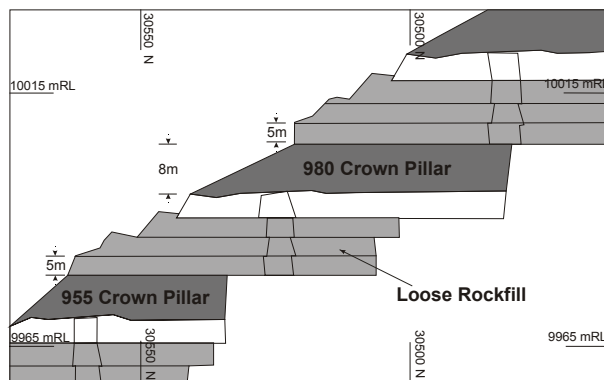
Long section view of typical Crusader Mine cut-and-fill layout (looking east).
